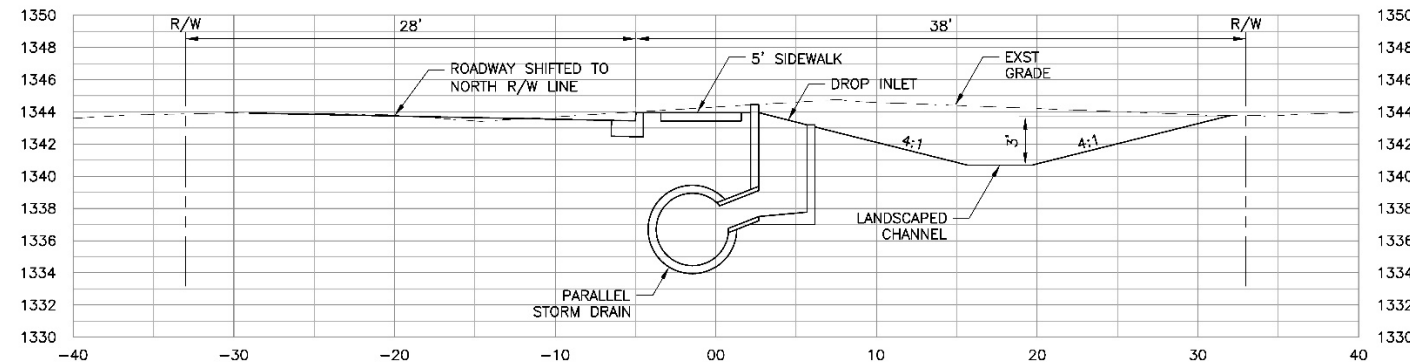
Cheney Channel Typical Section with Storm Drain Overflow Inlet (Facing East)
